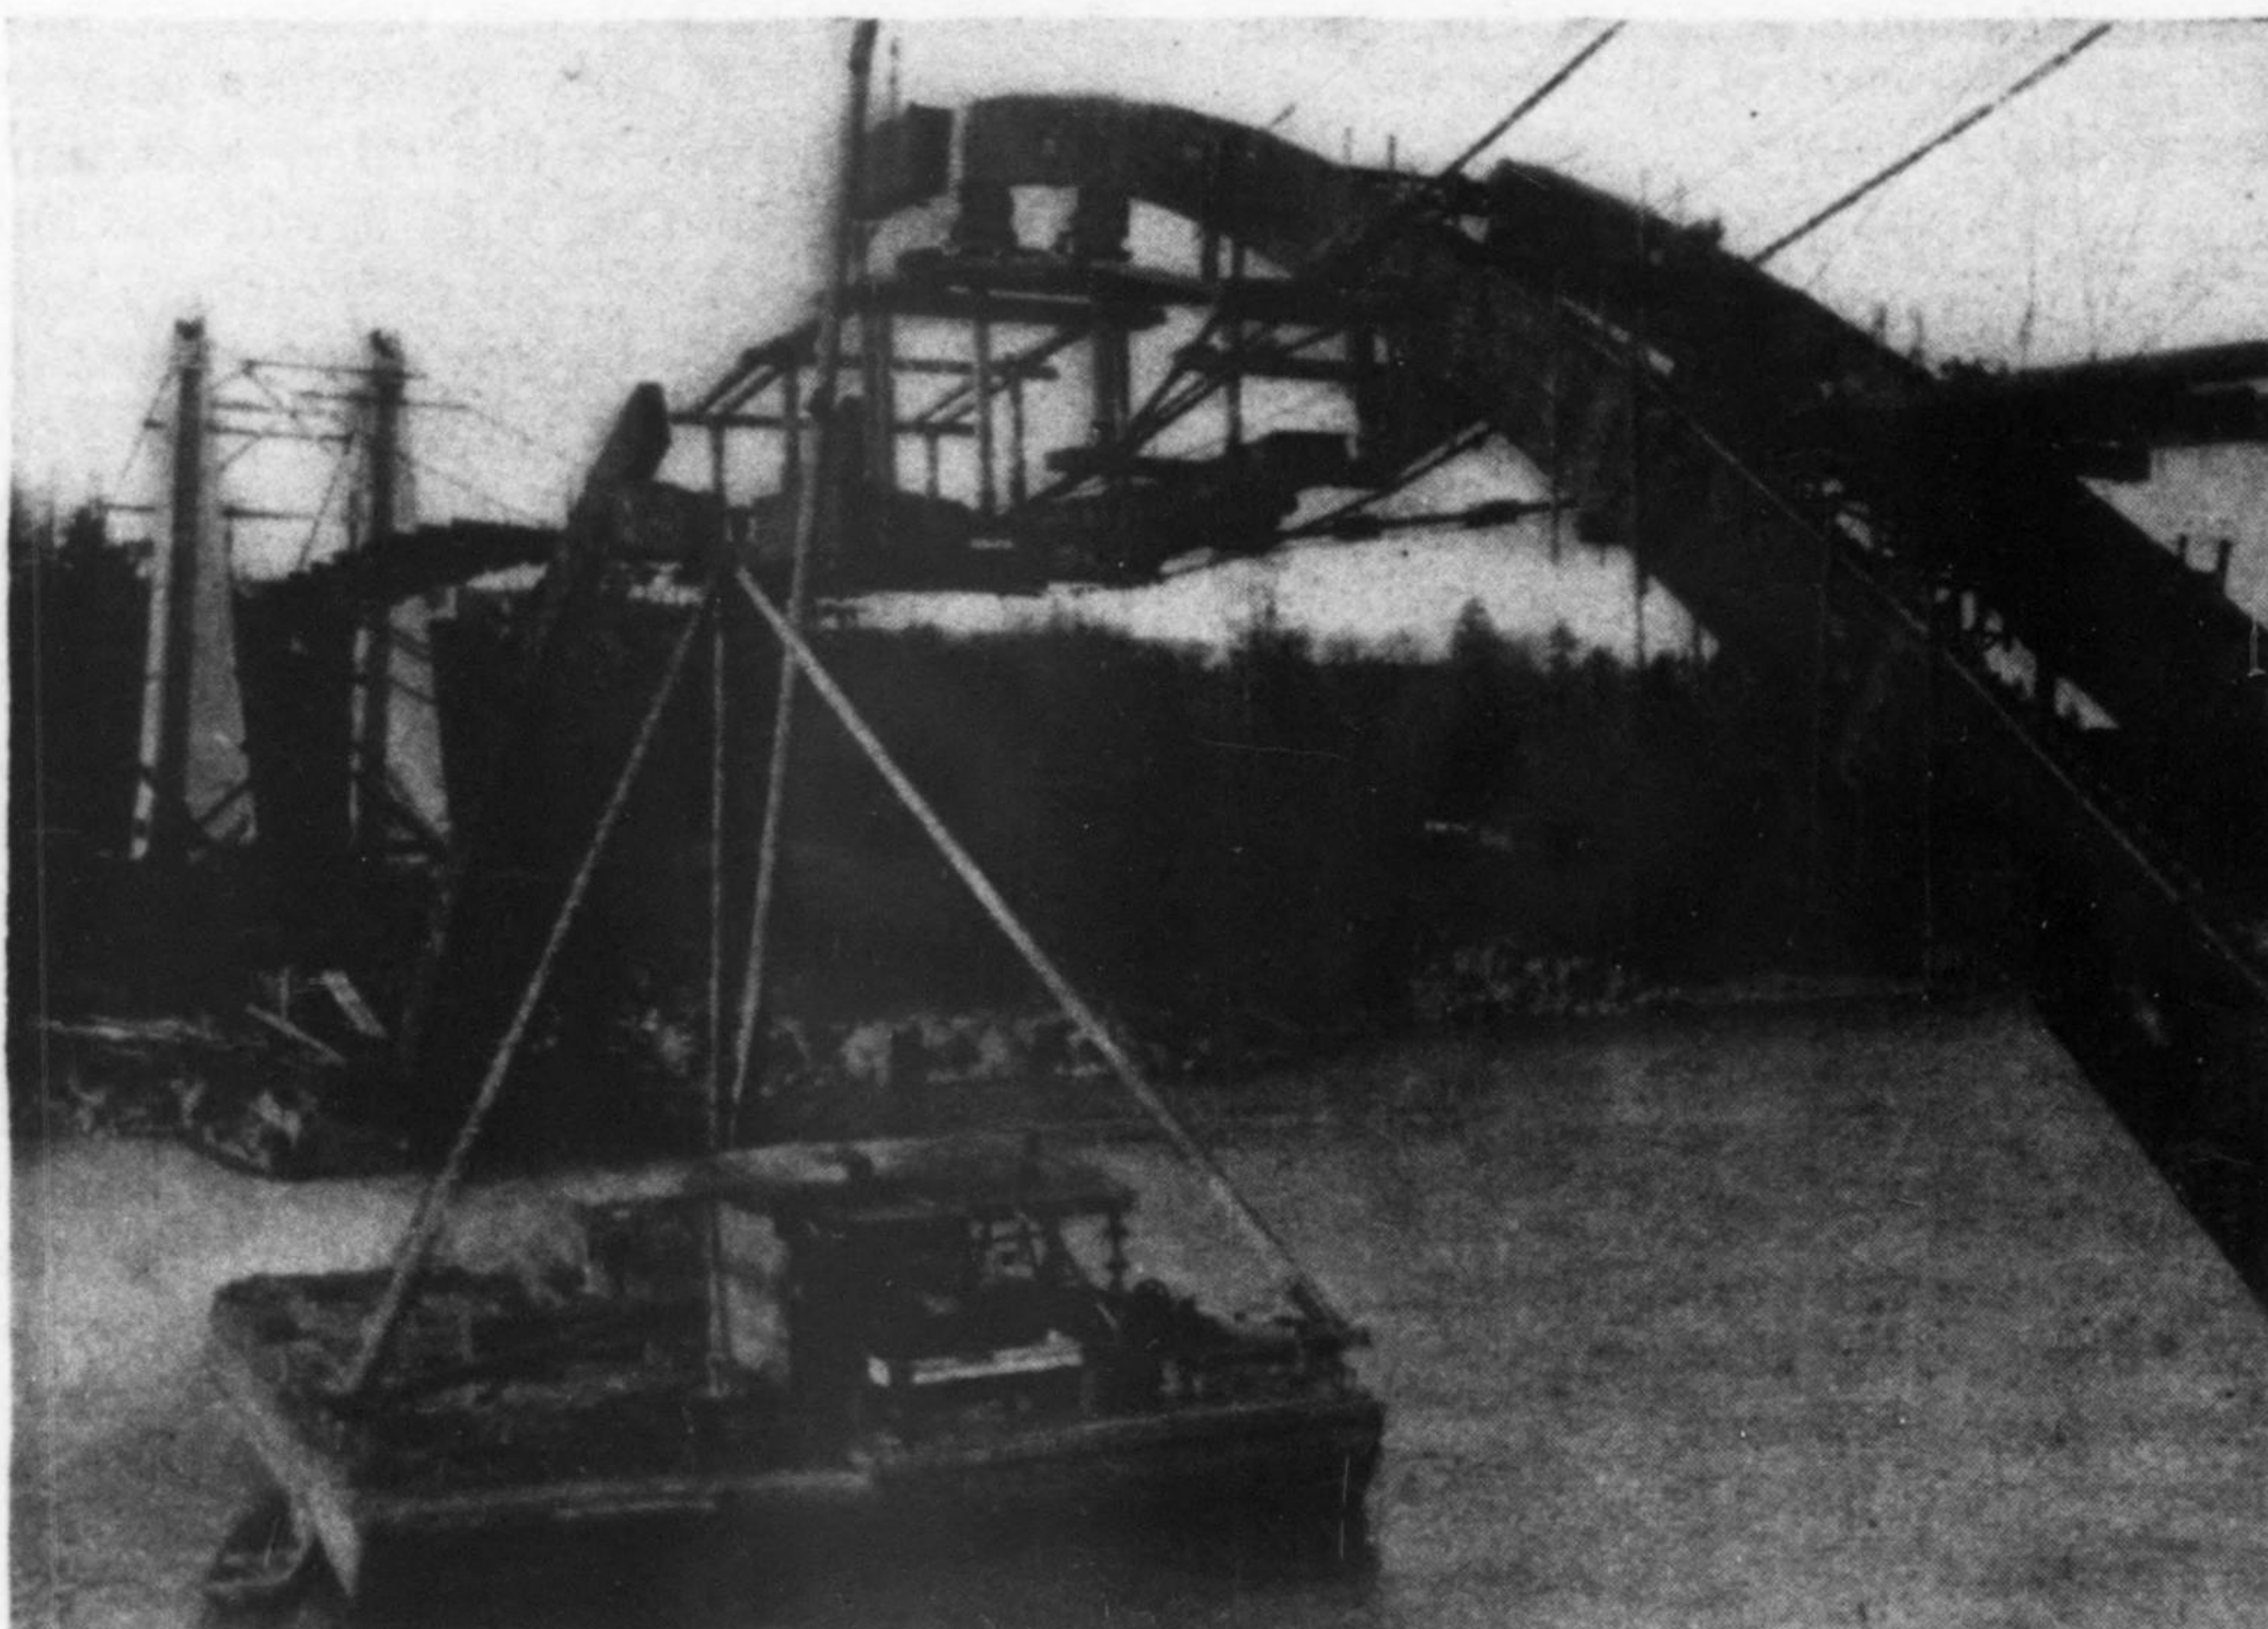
(above)—Old suspension bridge, replaced by new arch, was utilized in erecting the new steelwork for the Oregon City Bridge in 1922.
